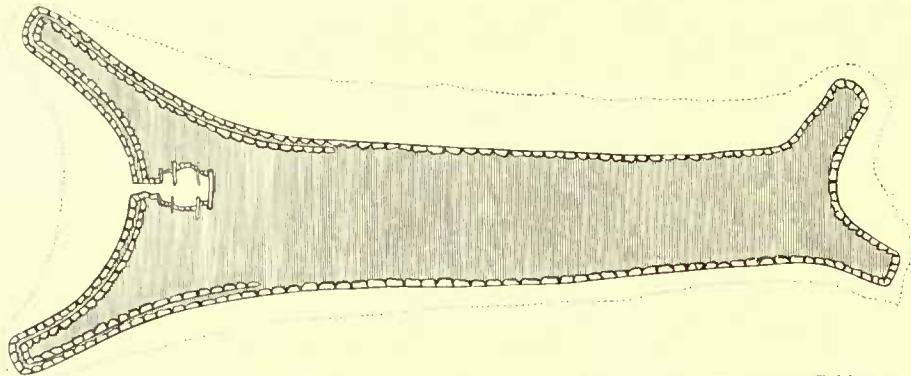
Ground plan of chambered long cairn, 240 feet in length, with 'horns,' at Yarhouse, Caithness.
